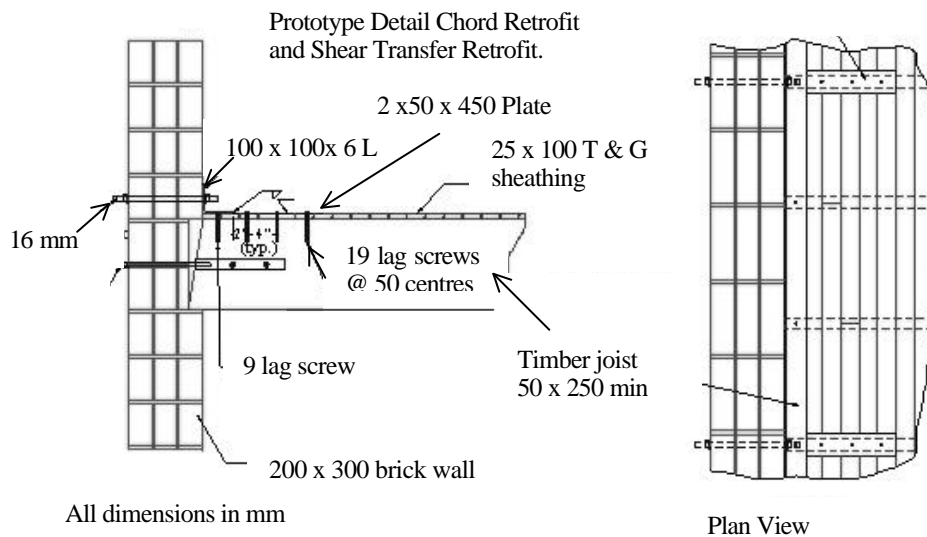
Floor Diaphragm Shear Connector Retrofit Technique
